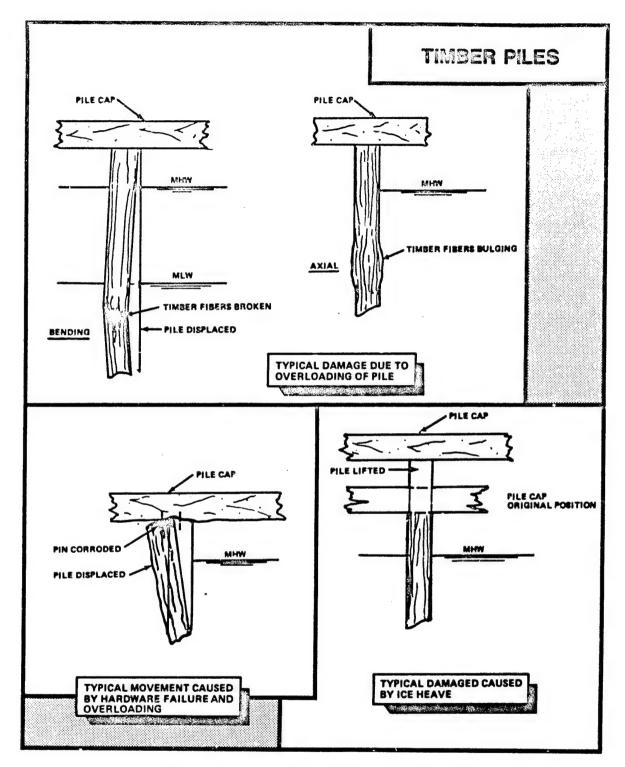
Typical Damage to Timber Piles Resulting from Corrosion and Failure of Hardware, Overloading, and Ice Heave.
